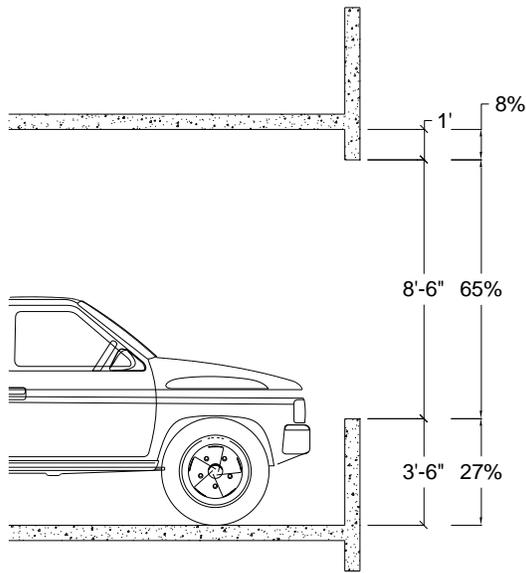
Cross-section of 65% Opening-to-Wall Height Ratio
